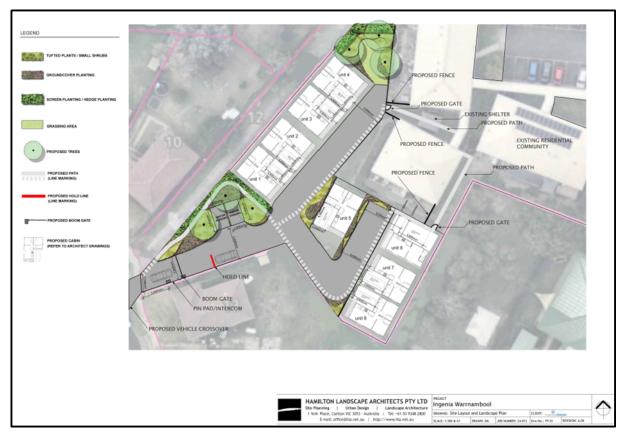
Proposed Site Plan & Landscape Plan. Source: Applicants submission
